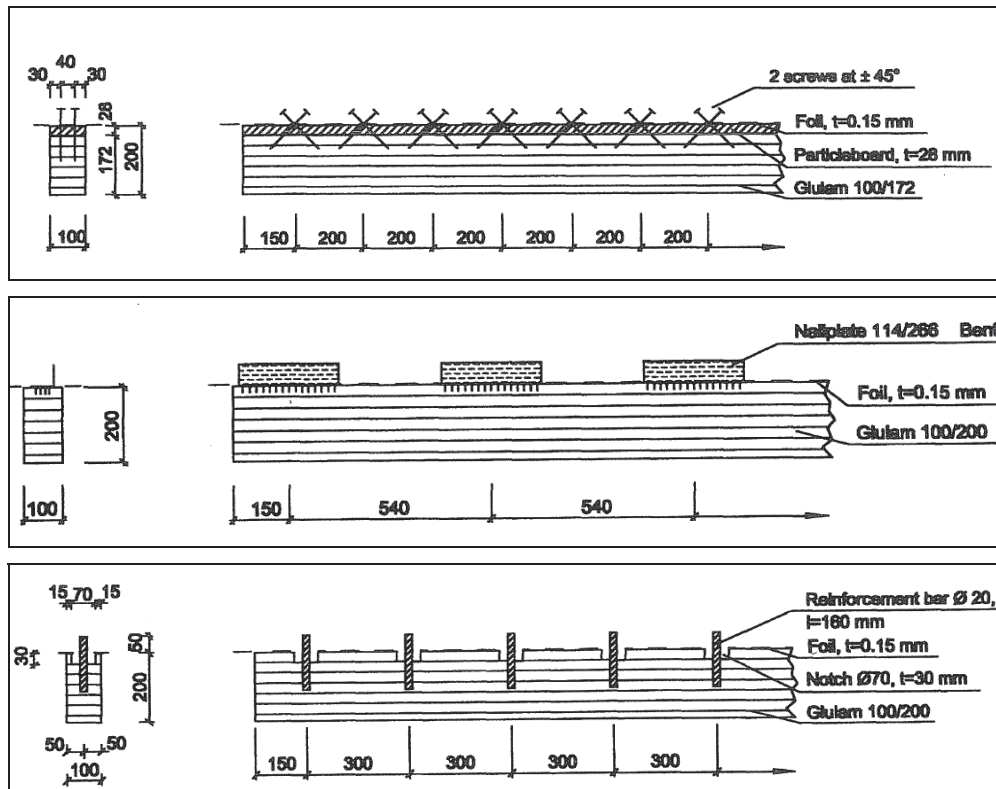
Connection types used in the laboratory tests of Van der Linden [4]
